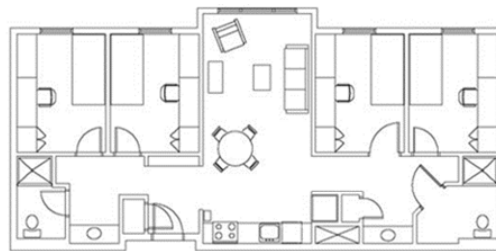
Four-Bedroom Apartment Unit (Private)
